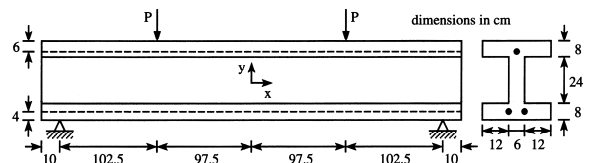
Rabczuk-Eibl specimen for prestressed concrete beam
